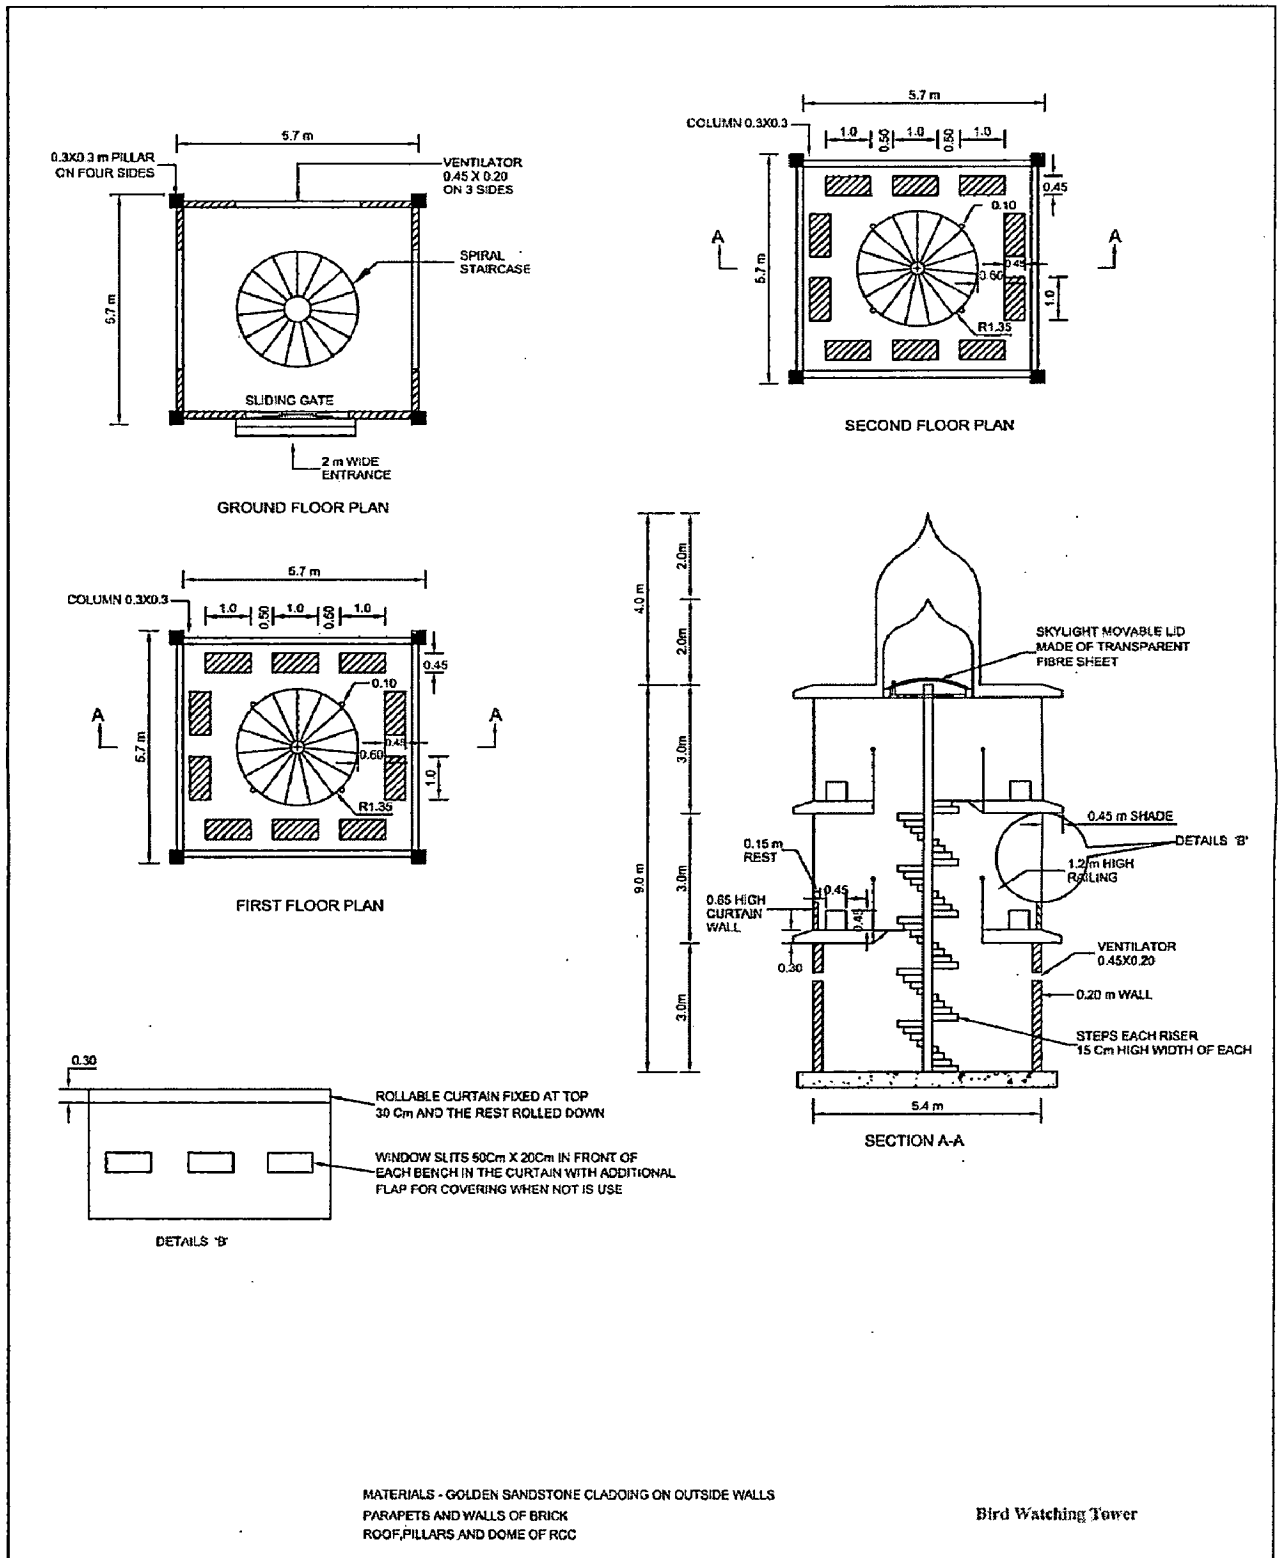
(a) Design Details of the Bird Watching Tower near the Gate No. 3
